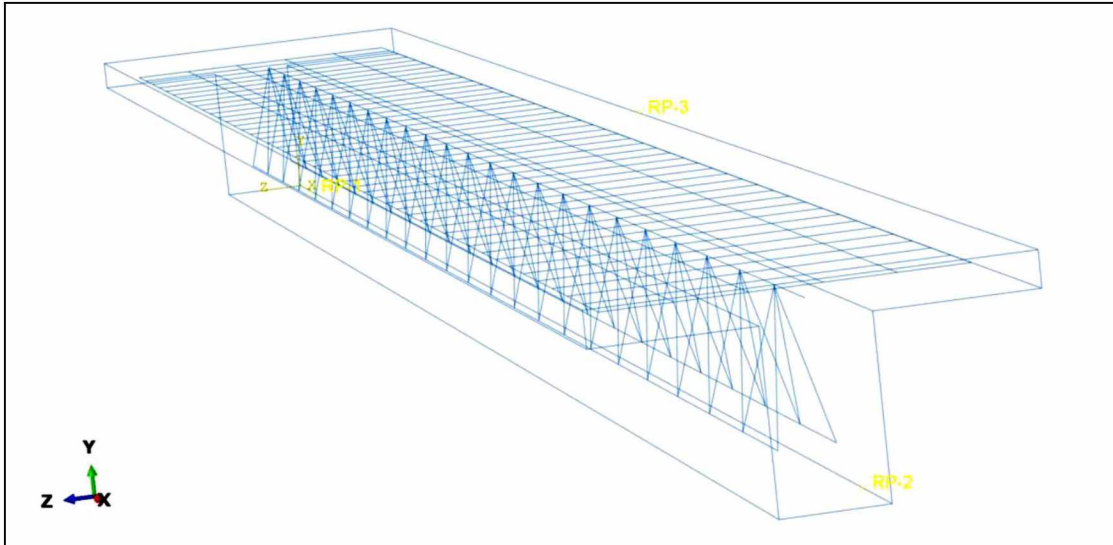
Mexican Chair Styled Reinforcement Embedded in T - Beam (TB1MS)
